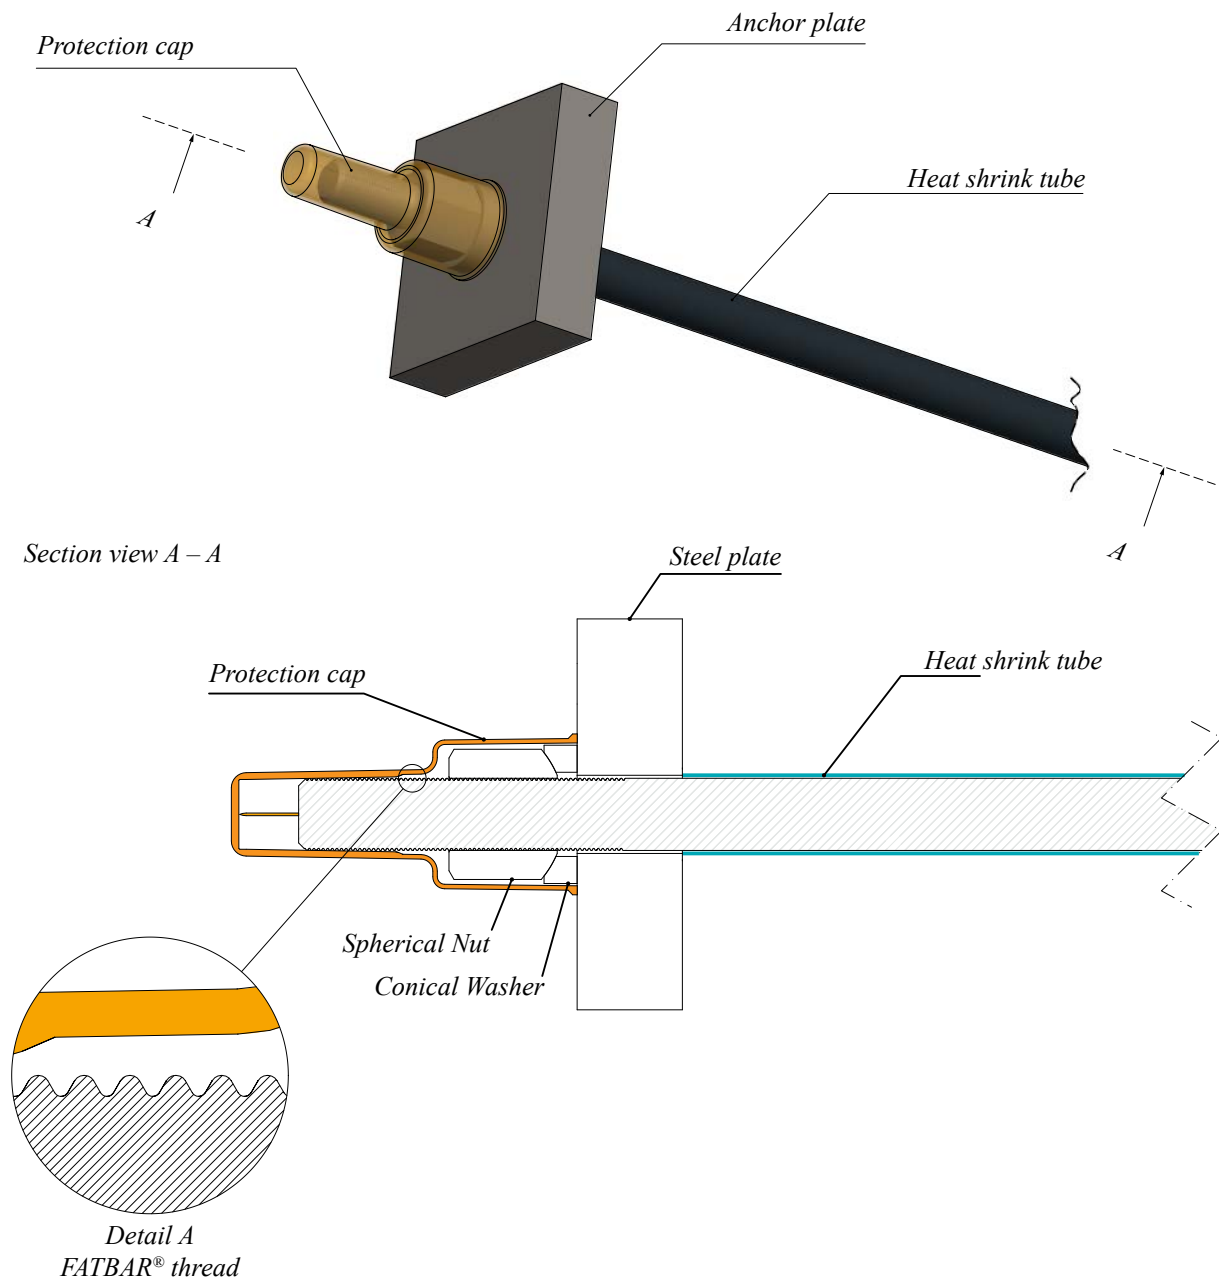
FATBAR® internal tendon sectional view of stressing anchorage end.
